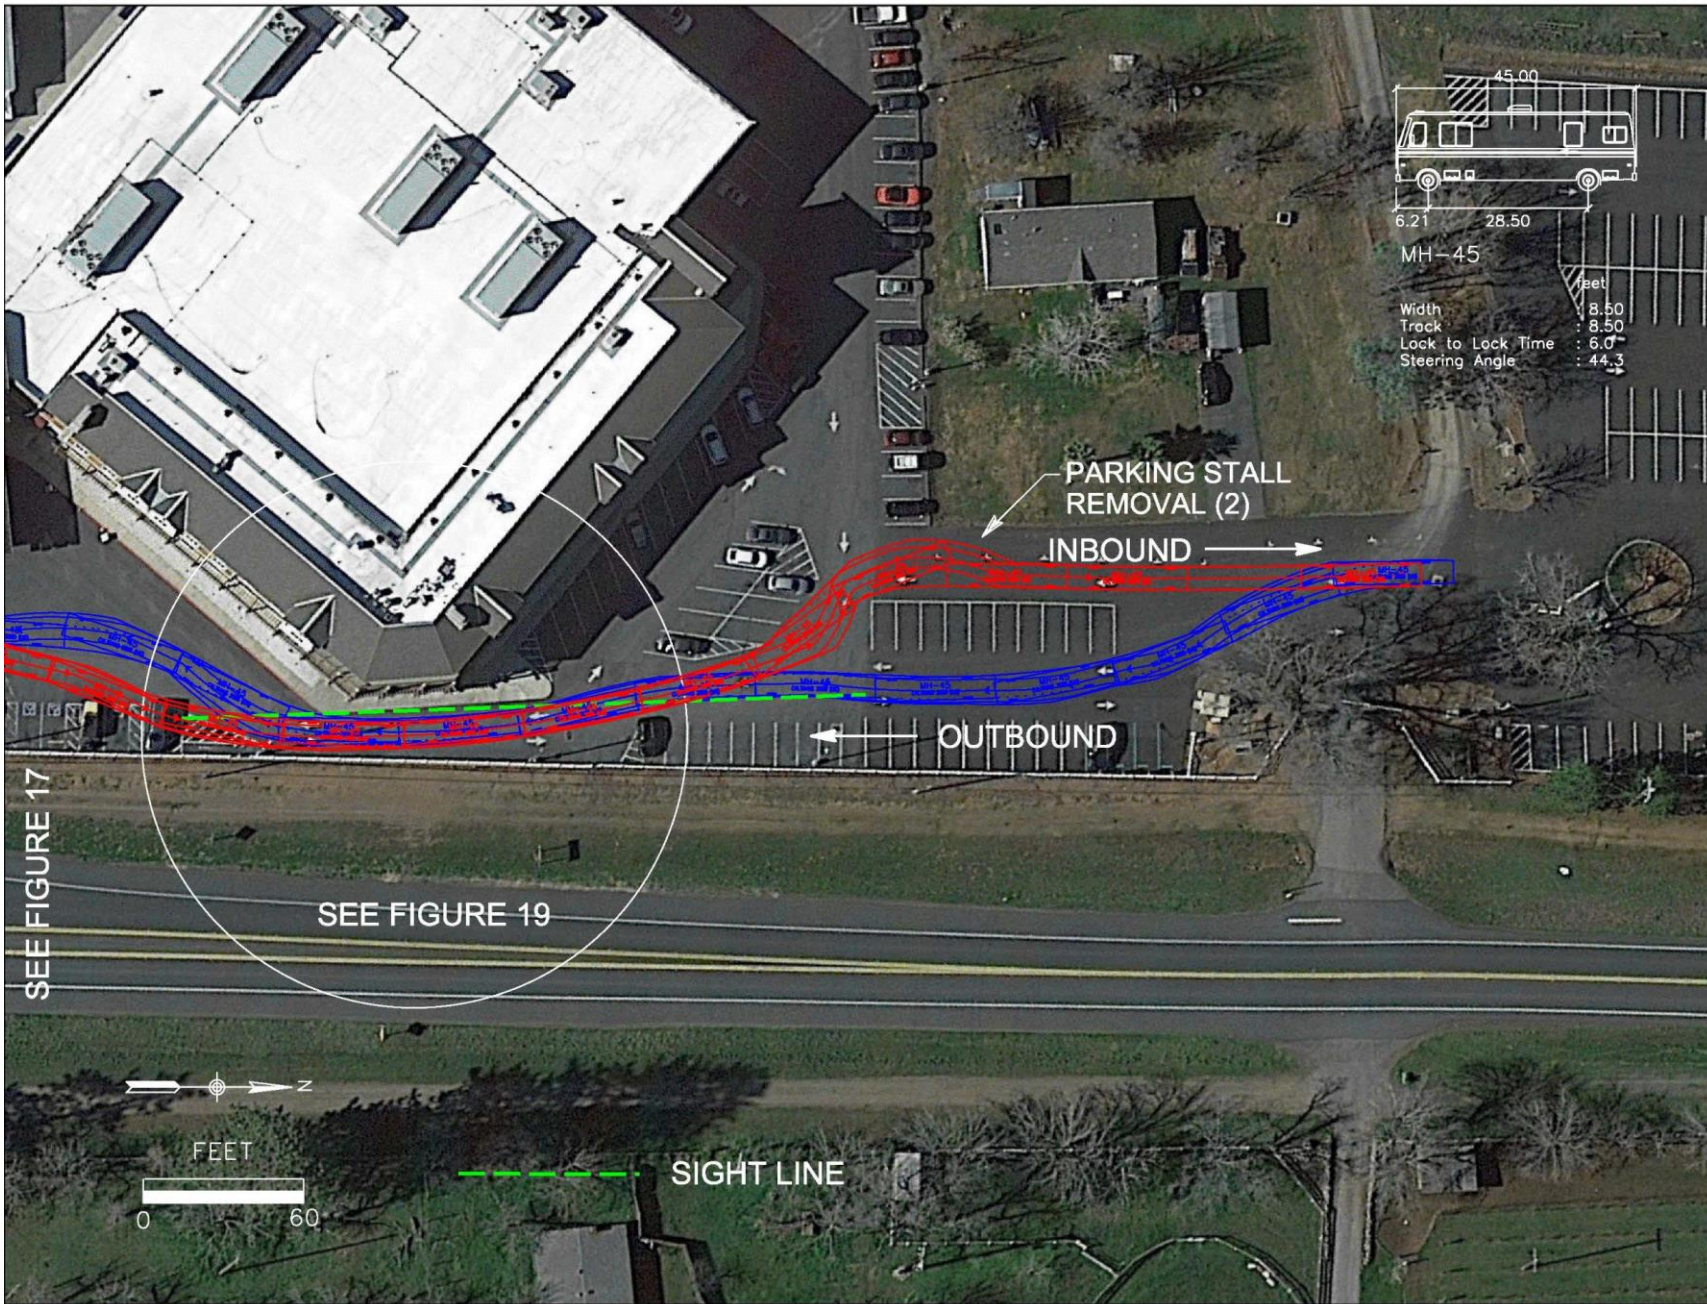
shows motorhomes completing turns, both inbound and outbound, at the SR 29 / Rancheria Road intersection. All turns can be made within the existing pavement. Inbound traffic will use the first driveway to enter the casino / hotel parking lot and travel north to the hotel entrance. Motorists will then turn right and head along the east side of the hotel to the “backside” of the site. A choke point is present between SR 29 and the hotel shown in Figure 13. Once past the choke point inbound motorhomes will make consecutive left and right turns to reach the overflow parking lot. Outbound motorhomes will exit the overflow parking area and veer to the left, so they have a direct line of sight past the choke point. Once past, the motorhomes will proceed along the hotel perimeter, and turn south to the northerly driveway.
